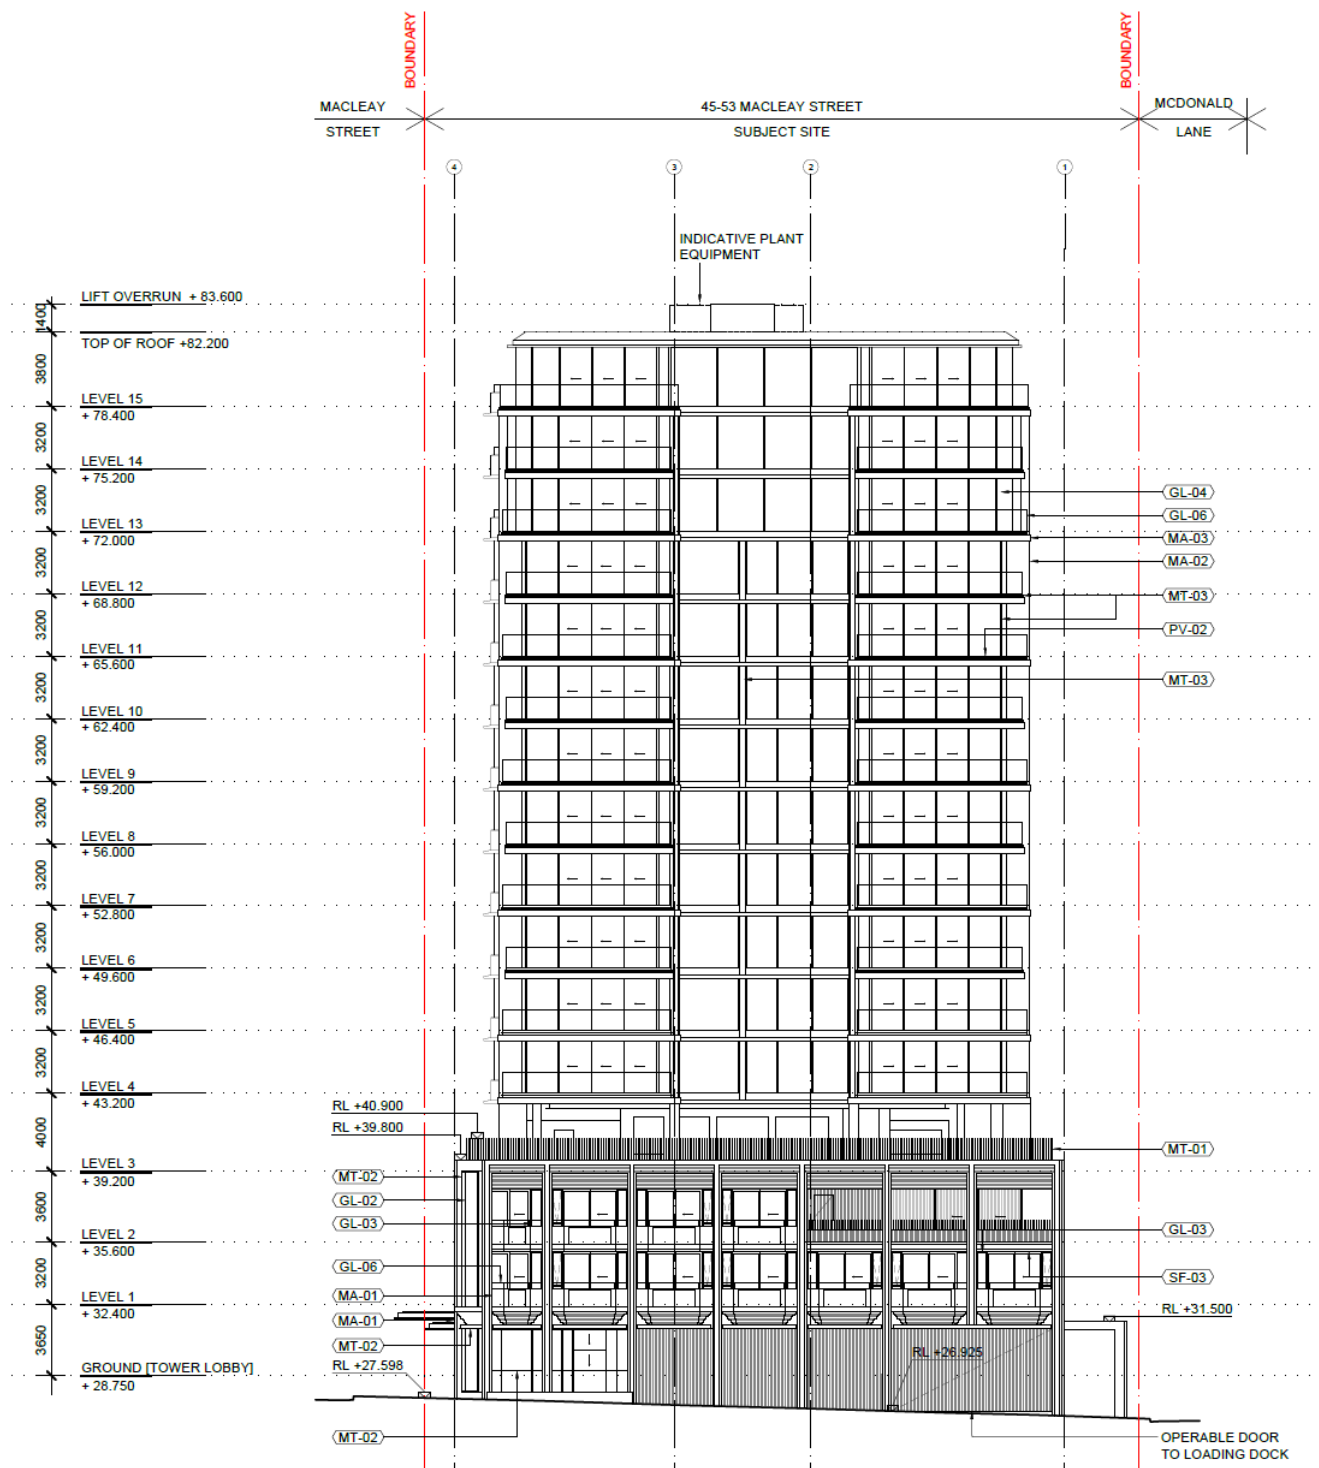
Site Plan for Proposed Development within Subject Property (Elevation) (KHA 2026)
